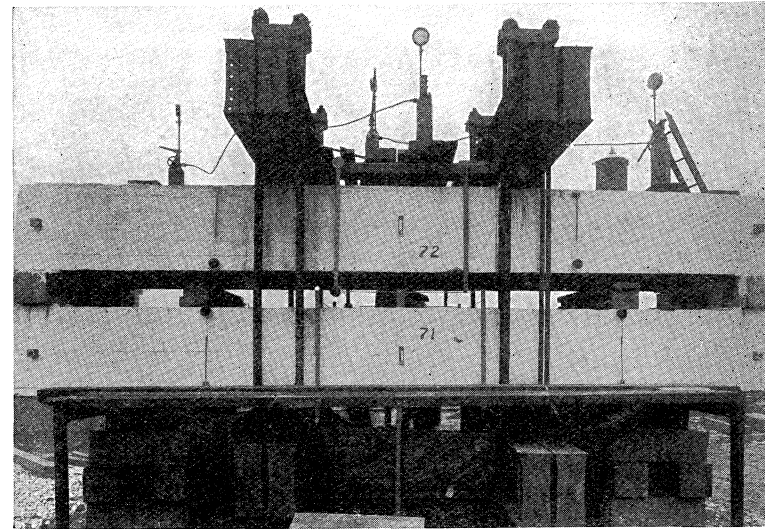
TESTING LARGE REINFORCED CONCRETE FLOOR SLABS
